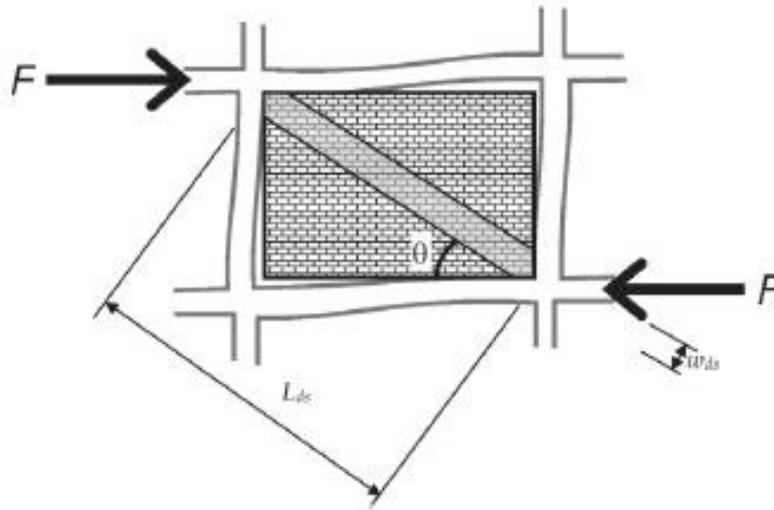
Equivalent Diagonal Strut of URM Infill Wall
